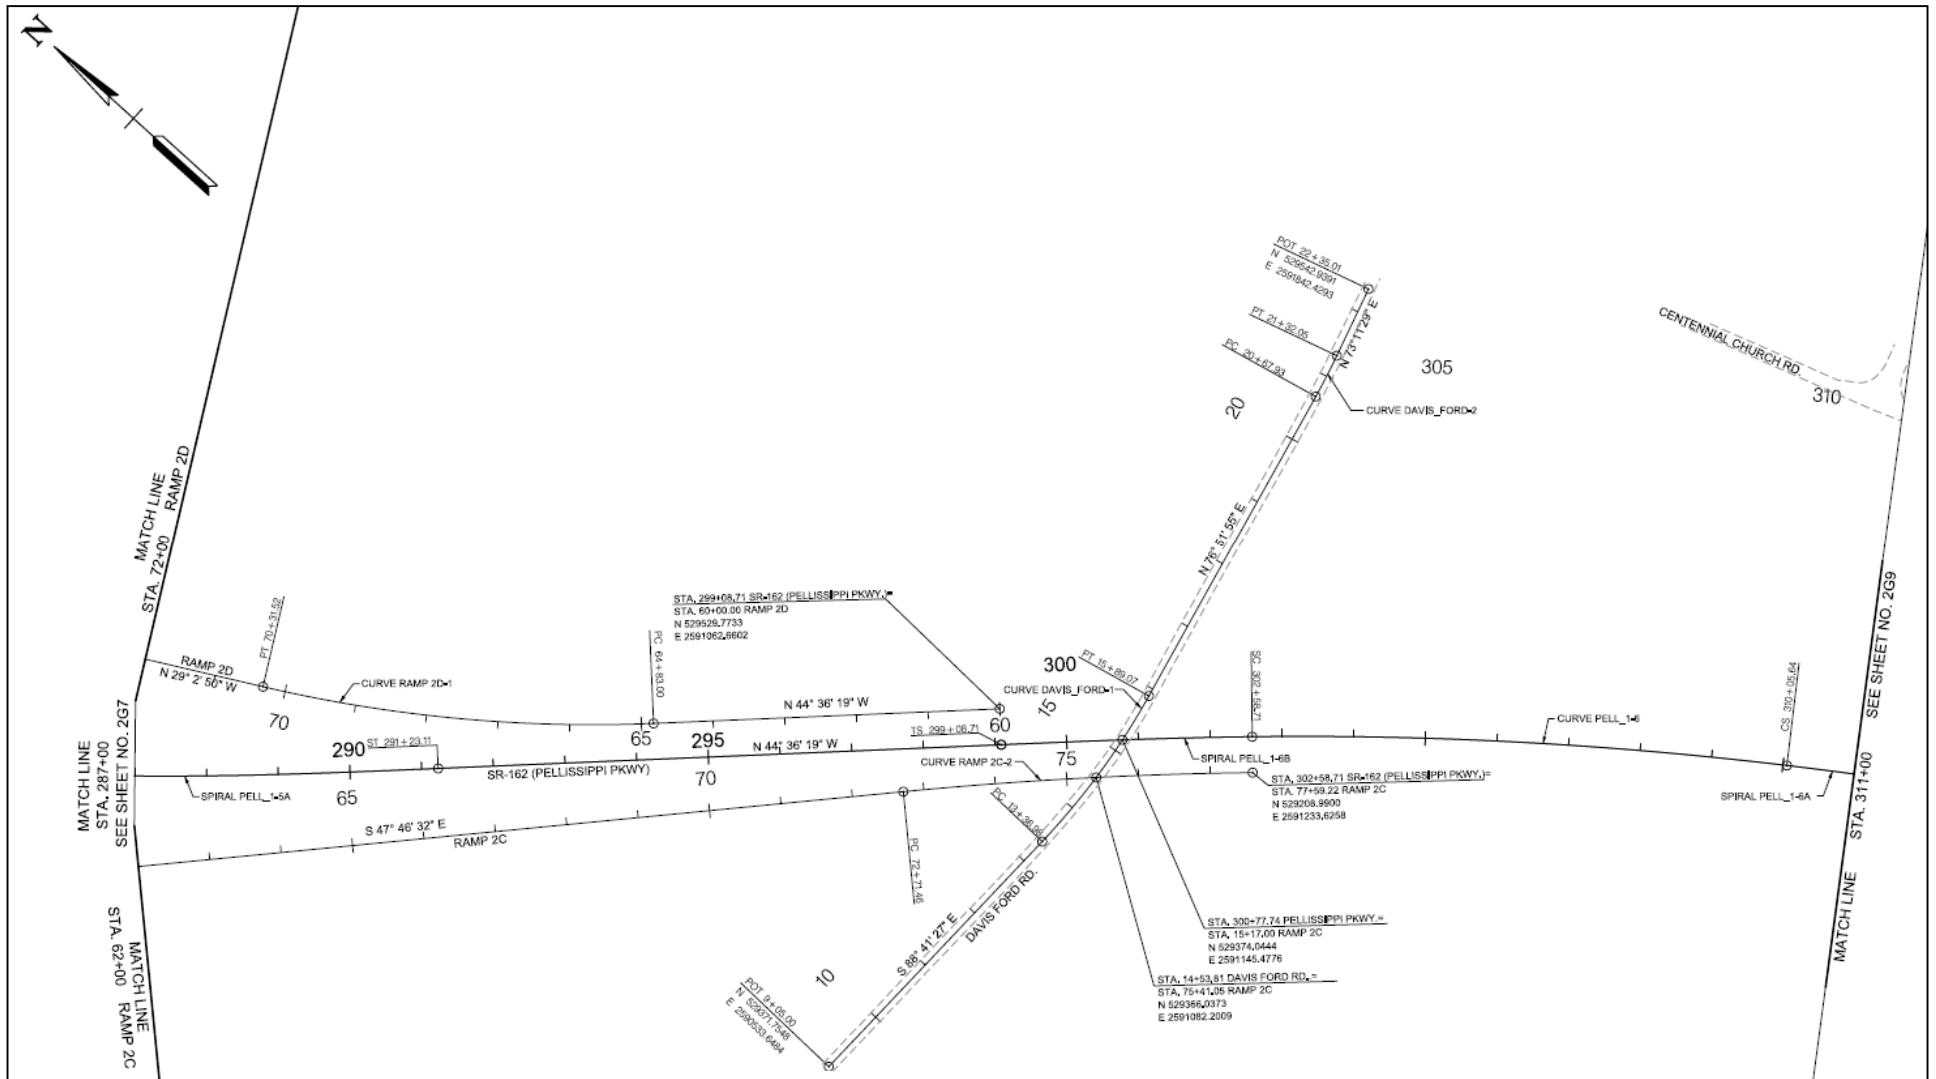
Overview 9 of 11 of the SR-162 Road Extension project from north to south.
